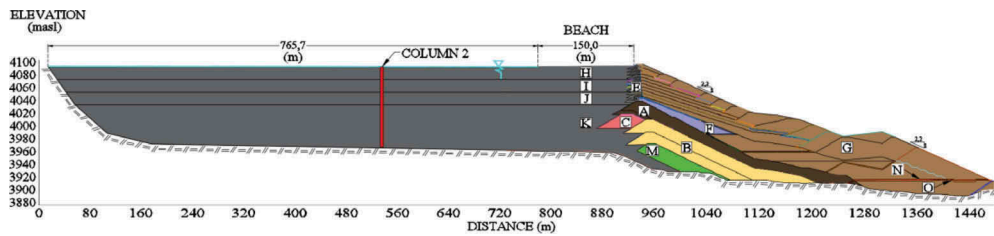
Cross section of the tailings dam after raising to elevation 4100 m above sea level.
